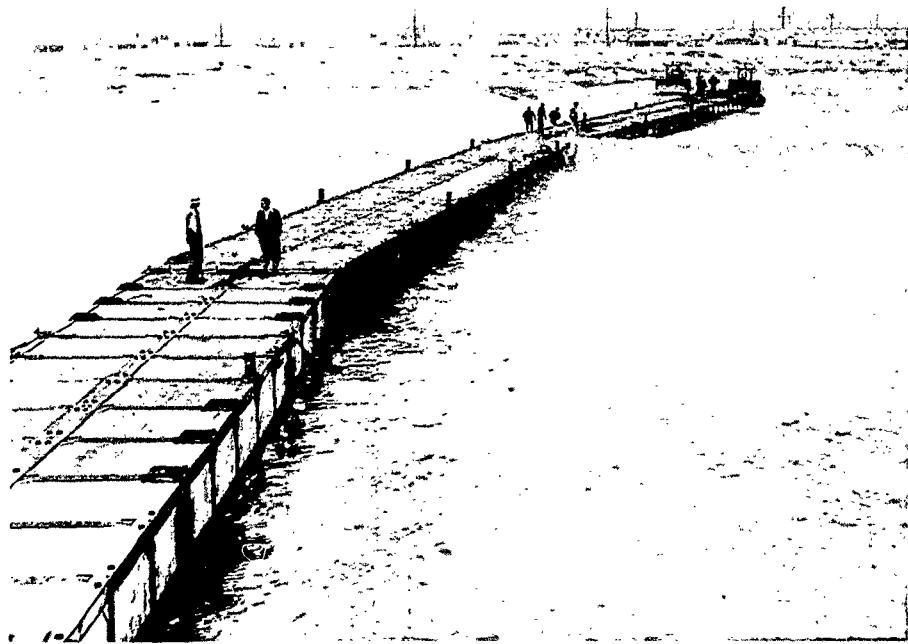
2 x 30 pontoon causeway joined end to end by "side chain connection". Note bow in causeway due to flexibility in connection.
